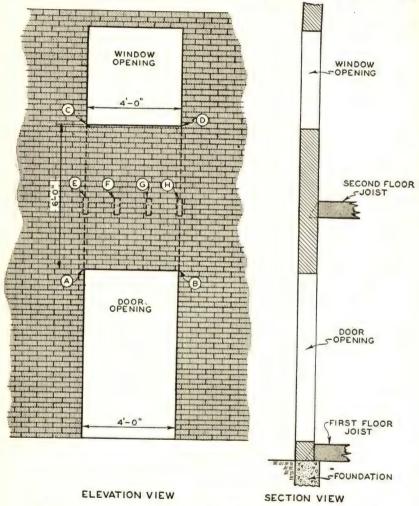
Example of Brick Wall Where Door Opening Lintel Must Support Second Floor Load in Addition to Spandrel
